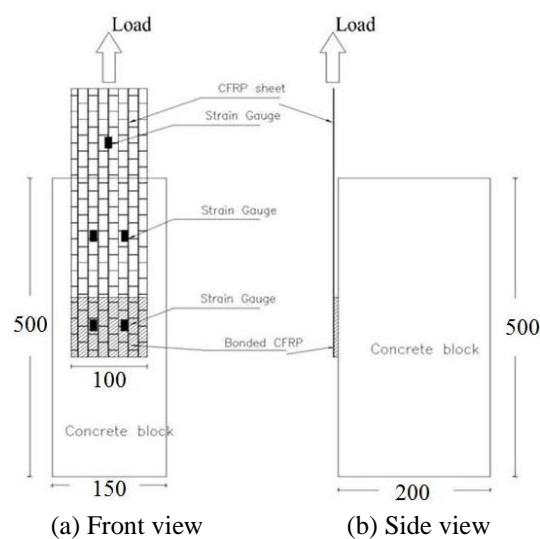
Schematic view for testing epoxy (dimensions in mm)
